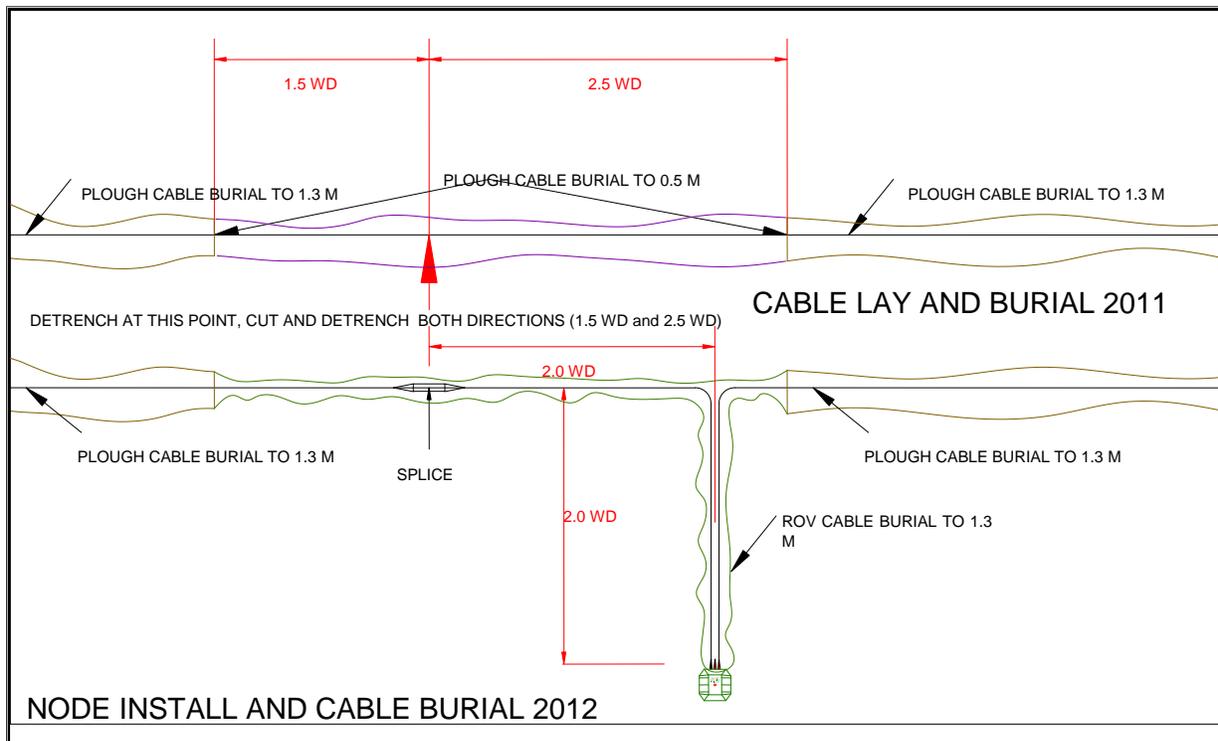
Proposed Cable Laying at Node Locations – Straight Continuous Piece Method
